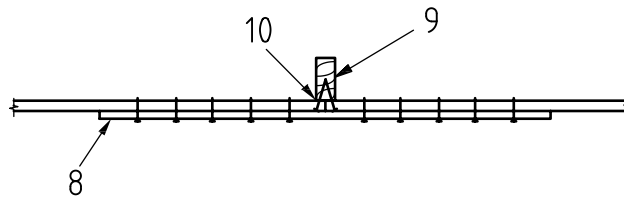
Standard bracing for rafter members: detail C2 and D2
